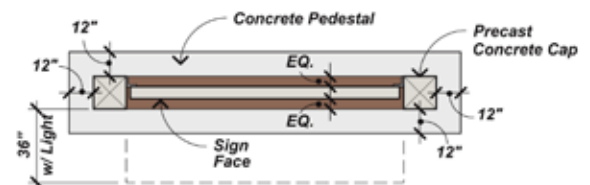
Typical identification entry sign for cantonments. See above for plan view illustrating typical concrete pedestal for signs.
